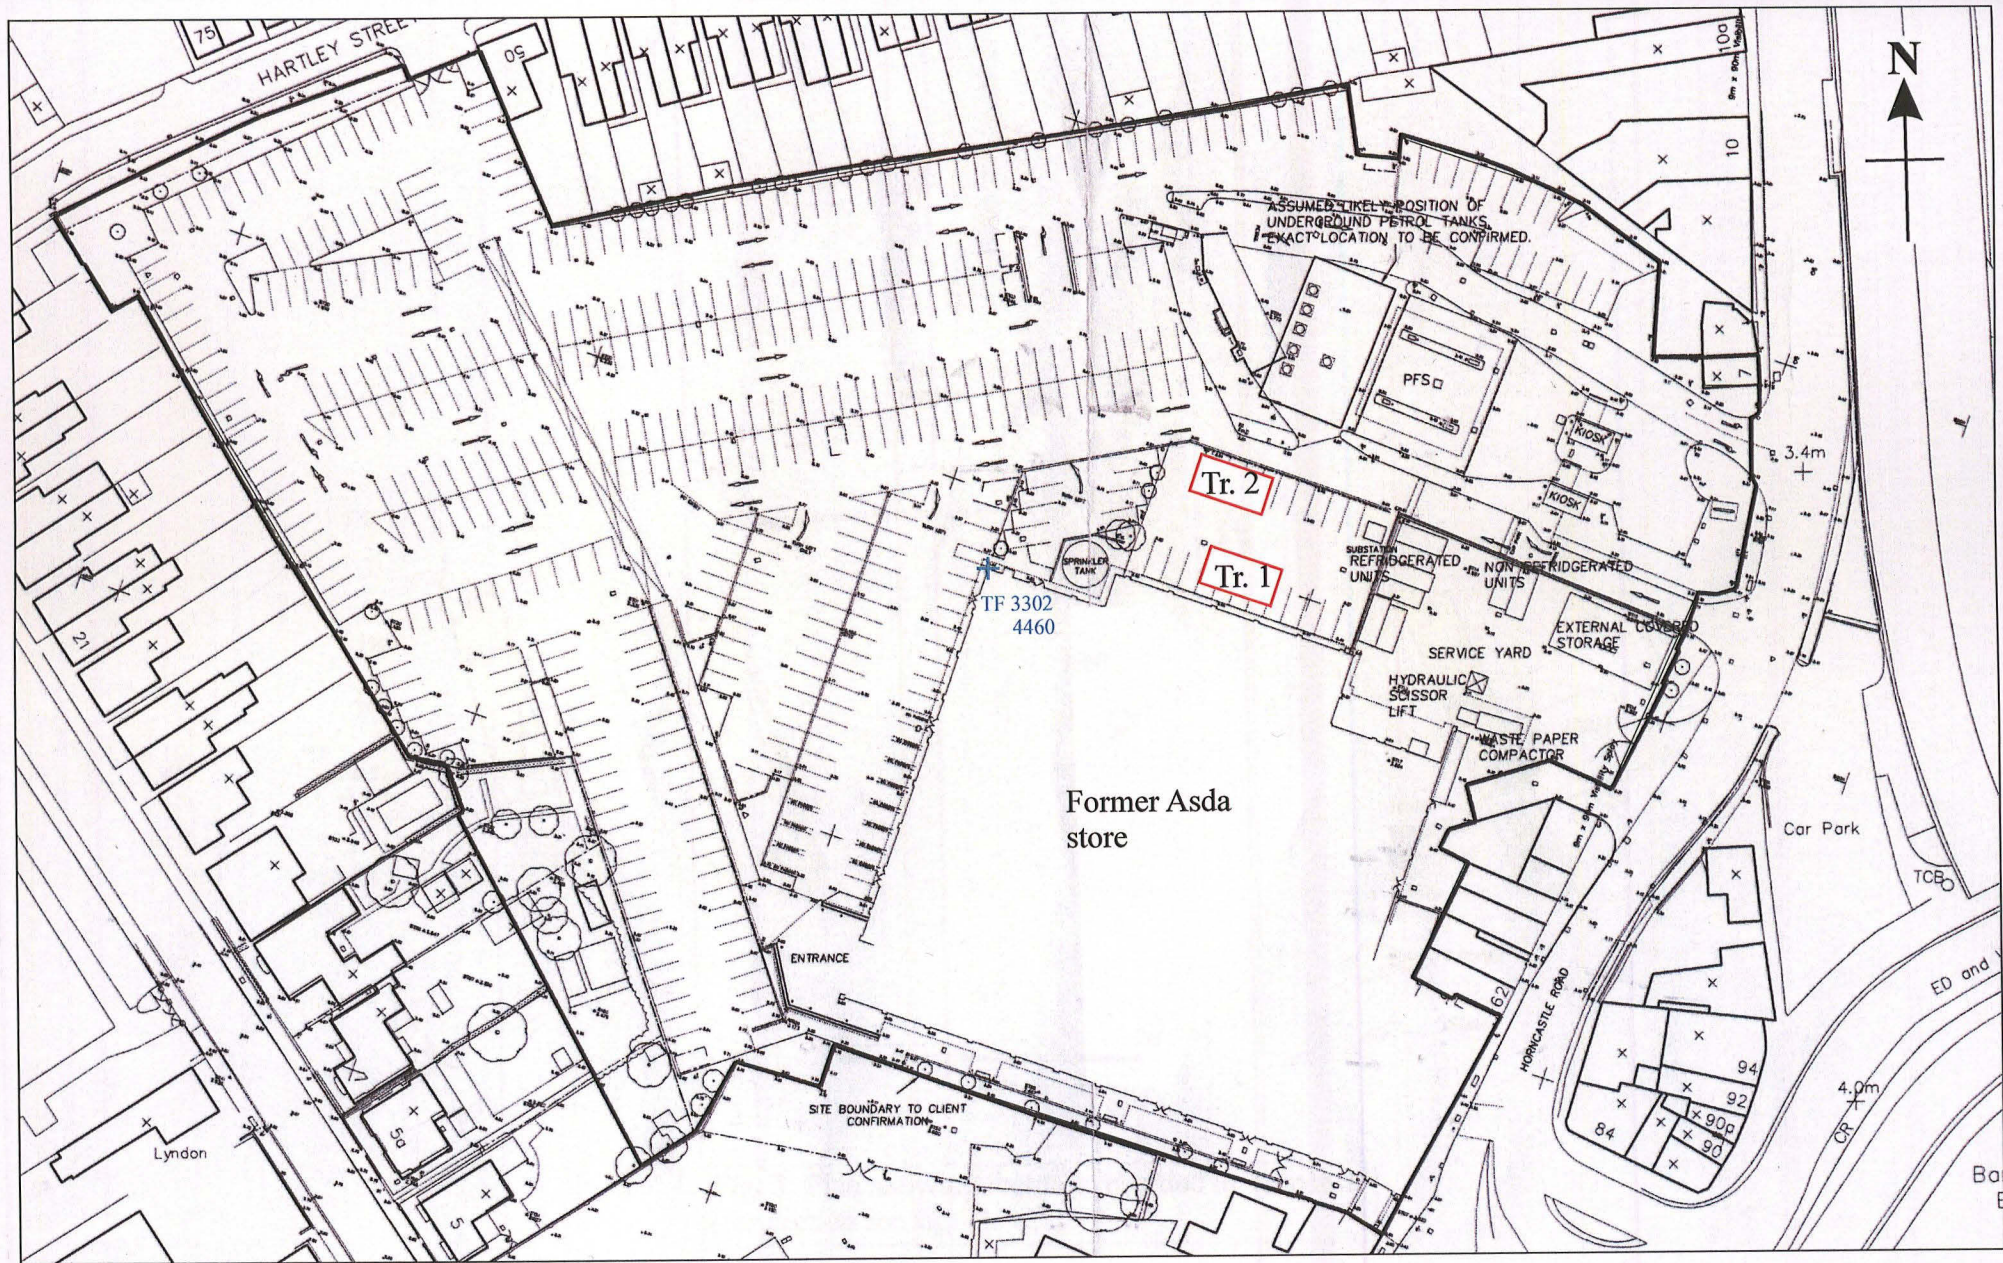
Site plan showing existing buildings and trench locations. 1:1000
